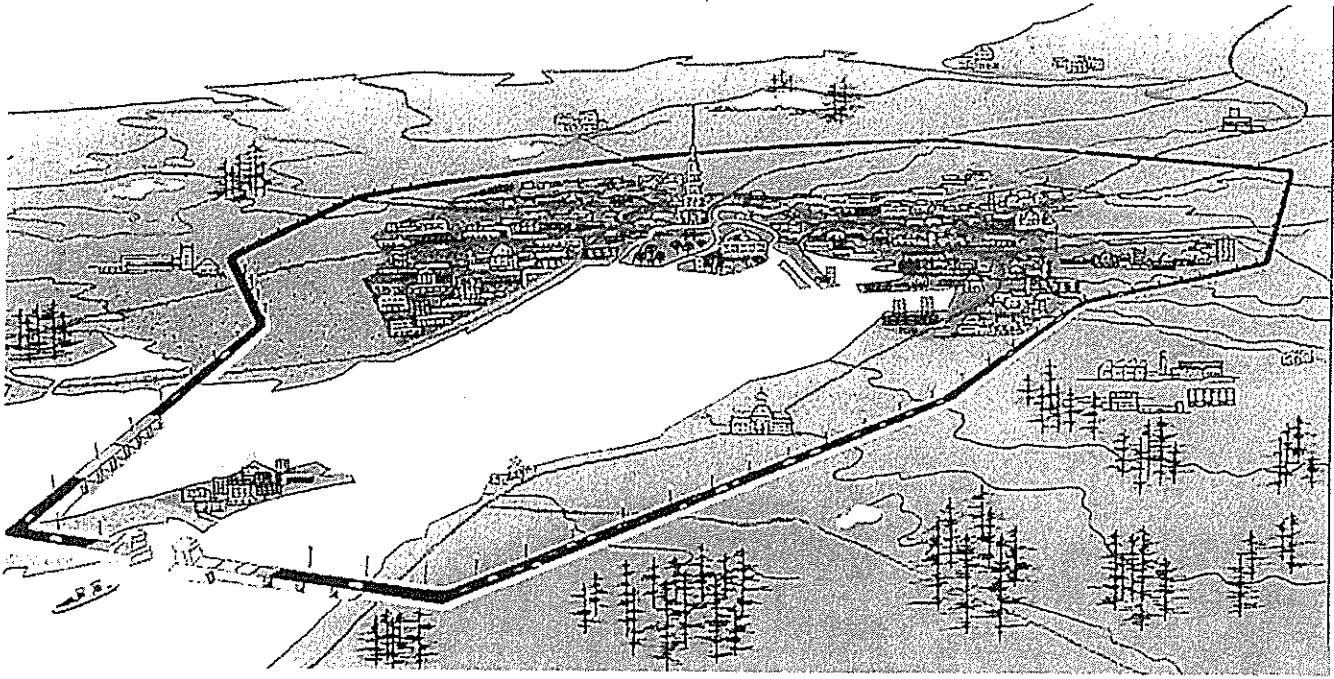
Ring road and storm surge barriers presently being constructed around St Petersburg, Russia.
